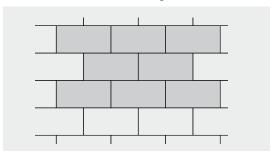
Vertical Sheeting Half-bond Pattern
